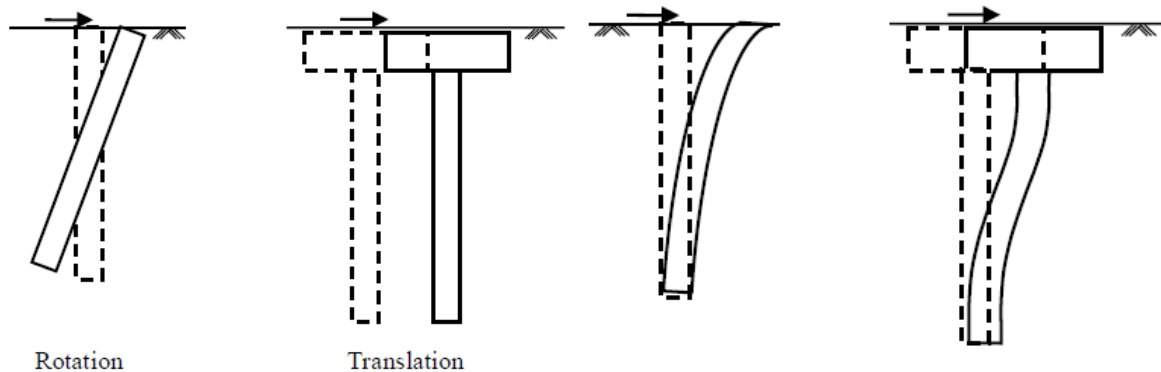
For rigid piles (left 2) and for flexible piles (right 2) (Basu, Salgado, & Prezzi, 2008).
